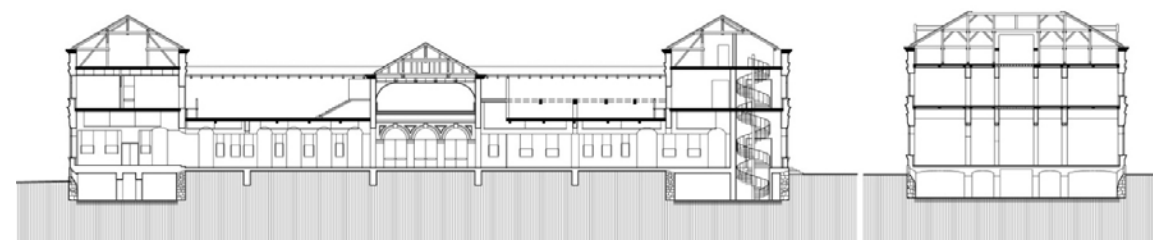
Railway station "Banja Luka City"; longitudinal and cross sections.
